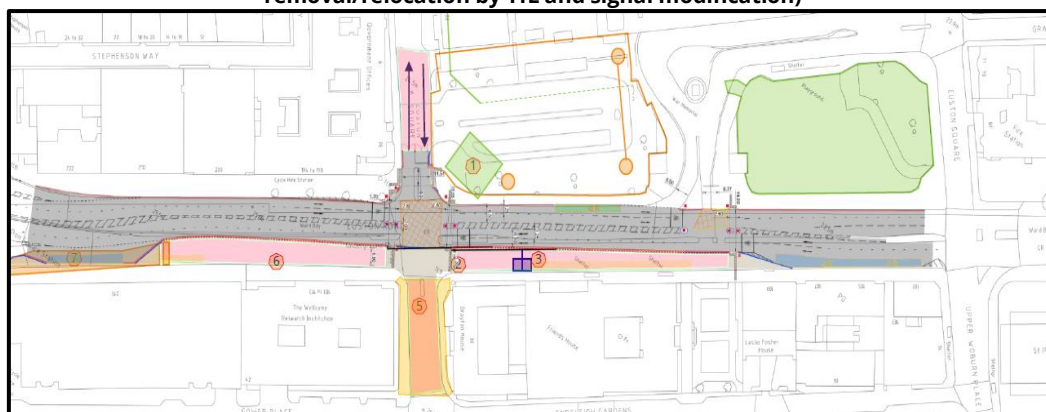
Euston Road South Section works (Primarily consisting of utility diversion and installation)
